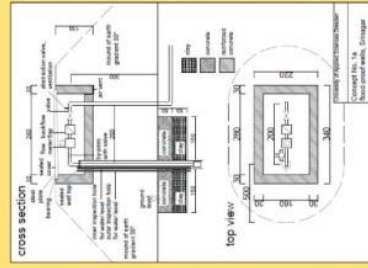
Design of a cement-concrete flood-proof RBF well head chamber built on elevated mound
